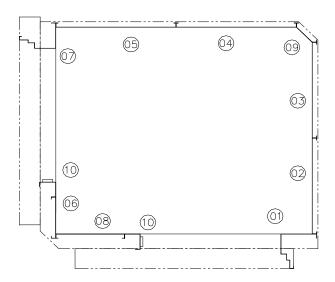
B. CAR PANEL AND ENTRANCE COLUMN ASSEMBLY (CORNER POST type "B")
